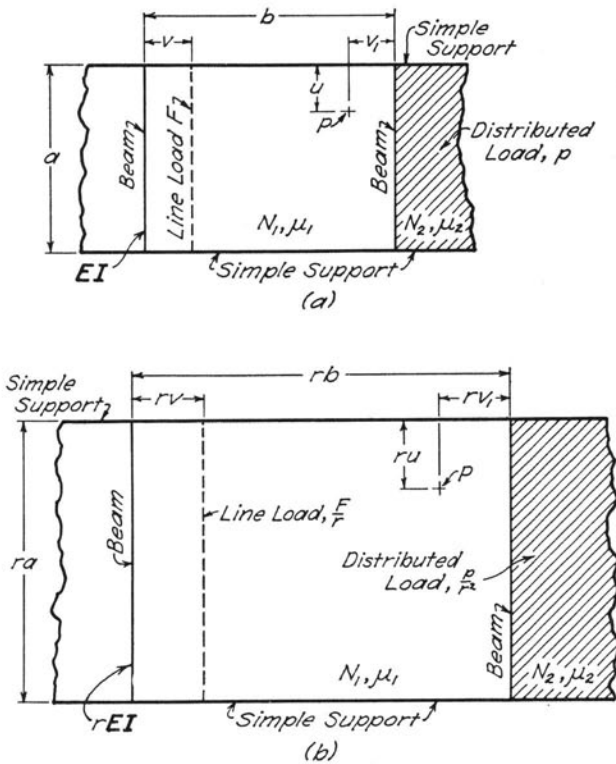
SIMILAR SLABS AND LOADING CONDITIONS
